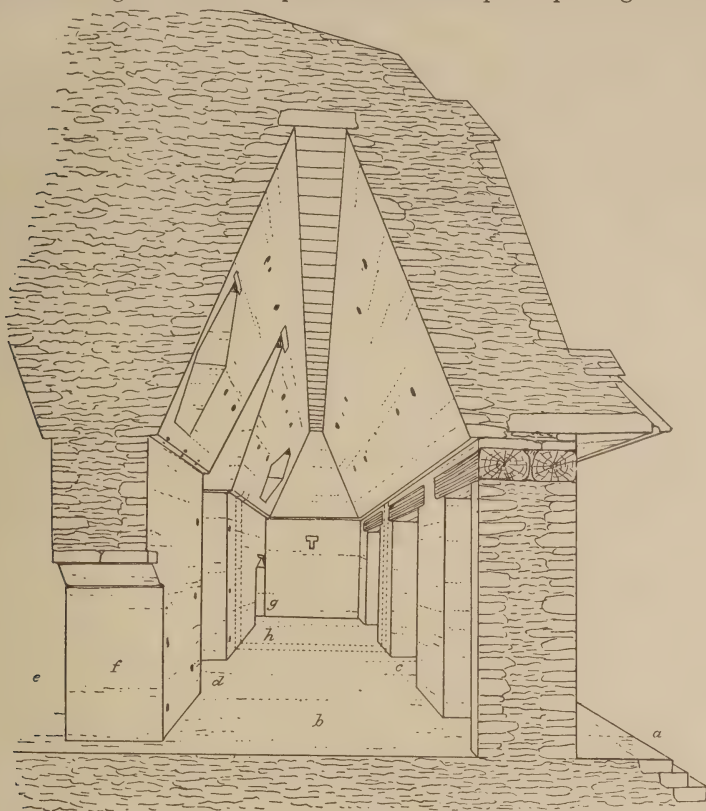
SECTION AND PERSPECTIVE OF OUTER VAULT OR VESTIBULE, TEMPLE OF THE SUN; LOOKING NORTH.
